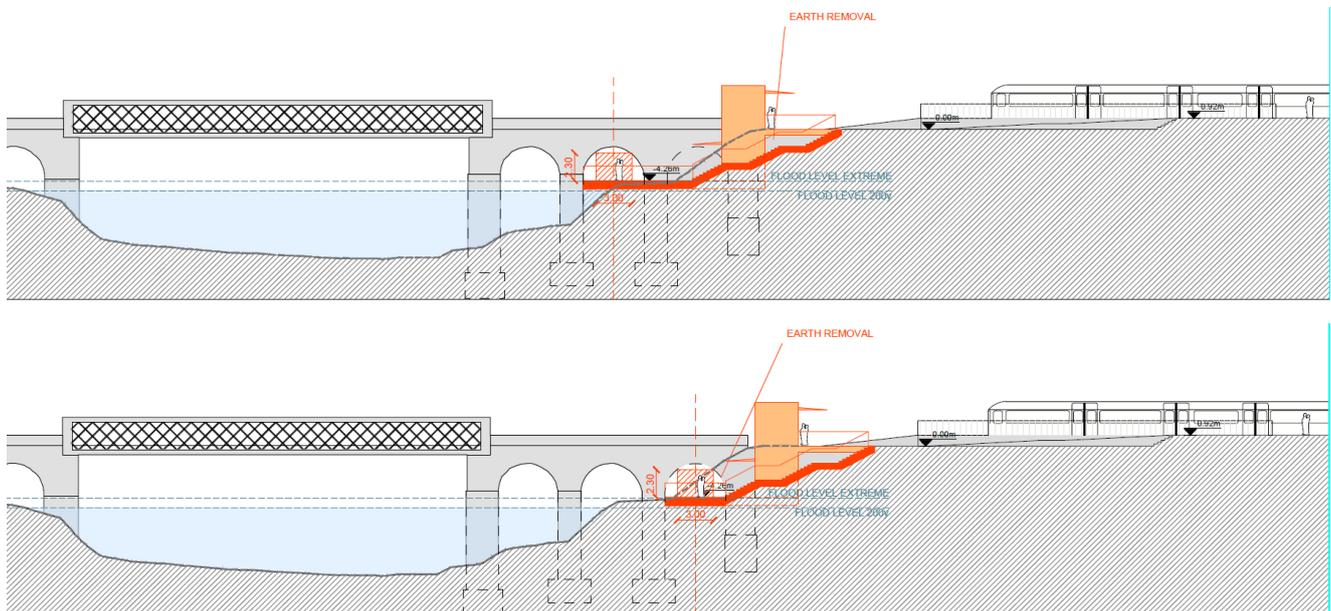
Station Option C - underpass with stairs and lifts – cross section options
